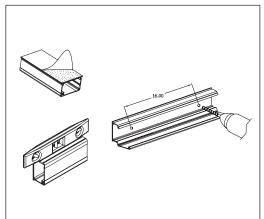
Secure raceway with included adhesive backing or drill holes for screw mounting. Use a level to align raceway.
